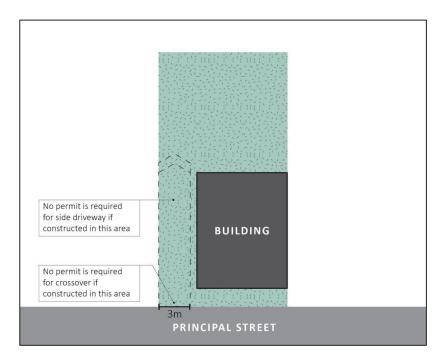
Construction of a new crossover and driveway is permit exempt if constructed in this location.
